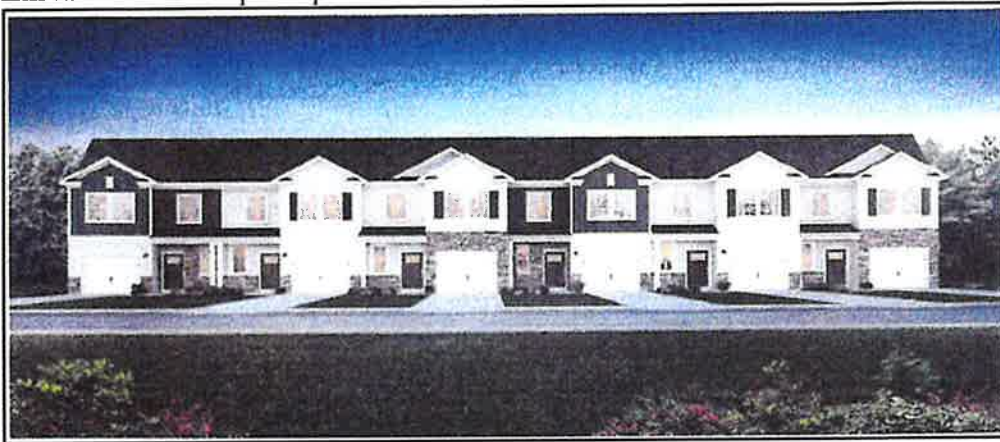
Exhibit B – Example site layout of townhouse structures with individual attached units on individual lots
